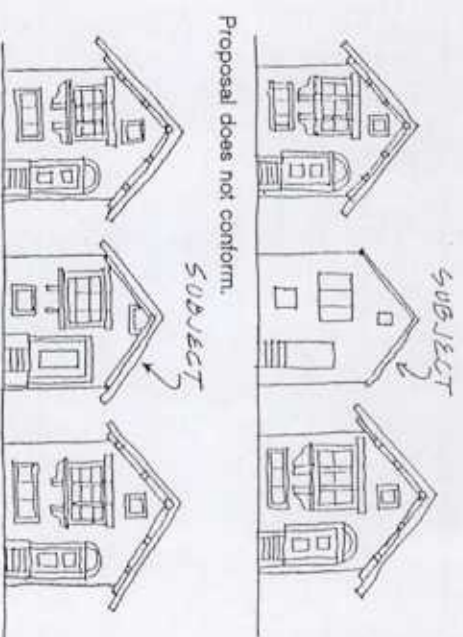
The use of door and window trim, window sill detailing, detail of the door, and detailing of the entry stairs establishes an architectural detail context.
